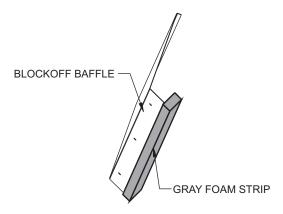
Adding Foam Strip to Block-Off Baffle
